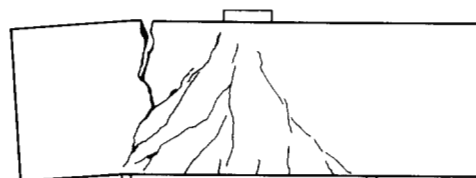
Figure II: Failure of Placas⁽³⁾ beams R4 ($a/d = 2.24$).
